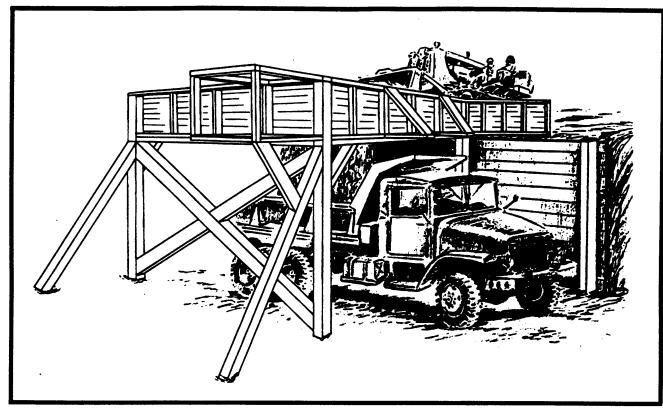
Single-End Trap, Truck-Drive-Through Loading Ramp
